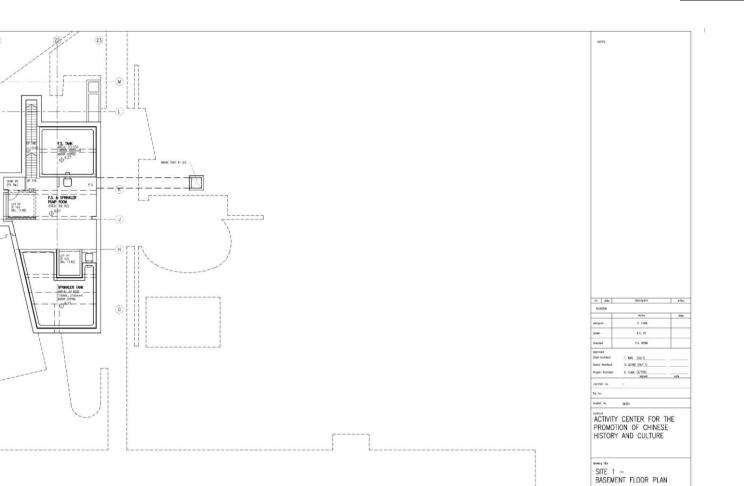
Proposed basement plan of Block 58 Conversion and the New Annex Building
